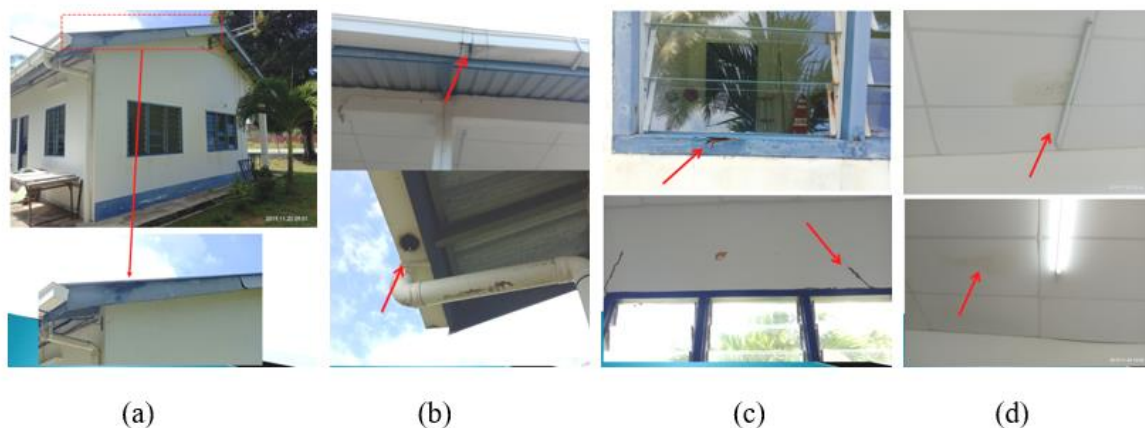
Photos of building component defects (a) pop outs at fascia board, (b) nonstructural failure at gutter and downpipe, (c) termites attack at window frame, (d) water mark on ceiling due to roofing leaking
